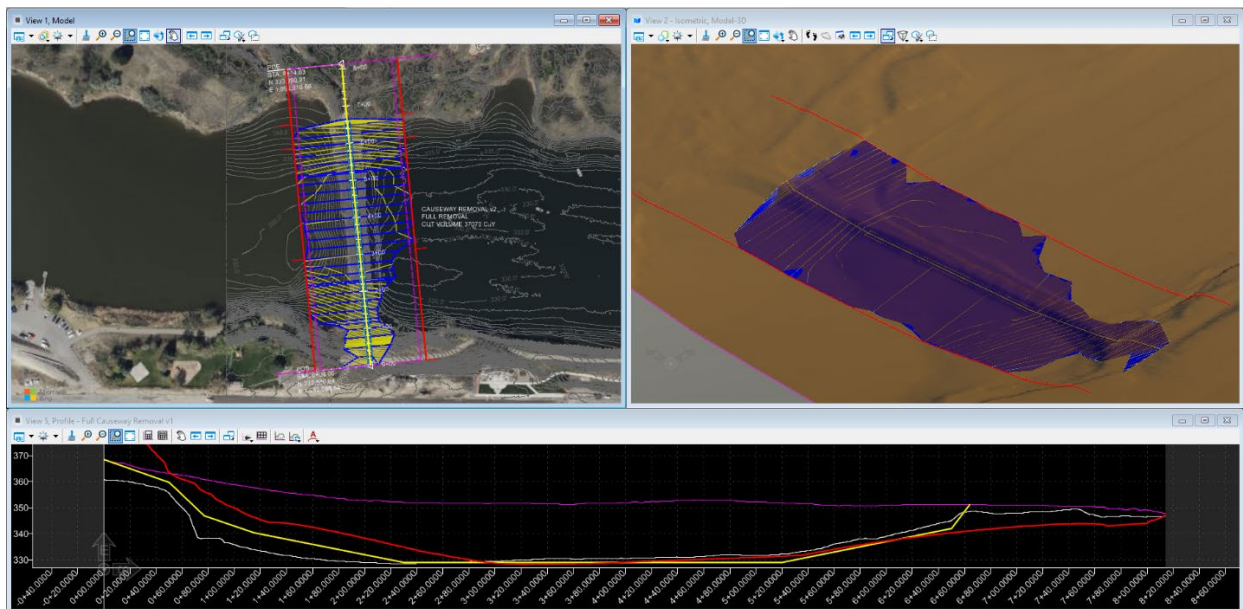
Cross Sections for Full Removal of Causeway¹
